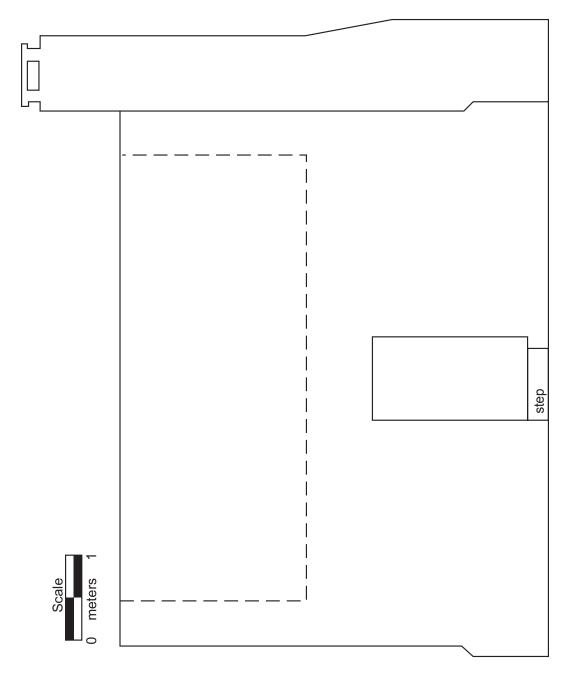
Elevation of northeast exterior side of stone structure at Rancho El Saladito.
